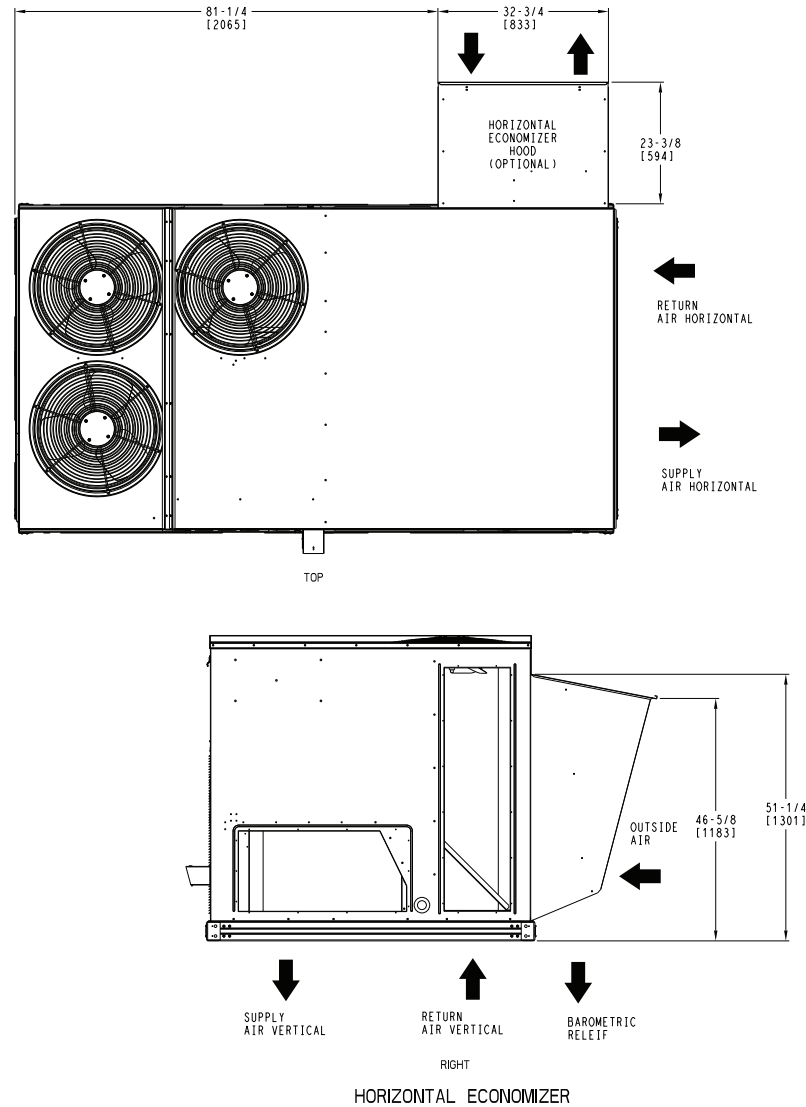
Unit Dimensional Drawing, 48WE*H08, Single-Zone Electric Cooling with Gas Heat
